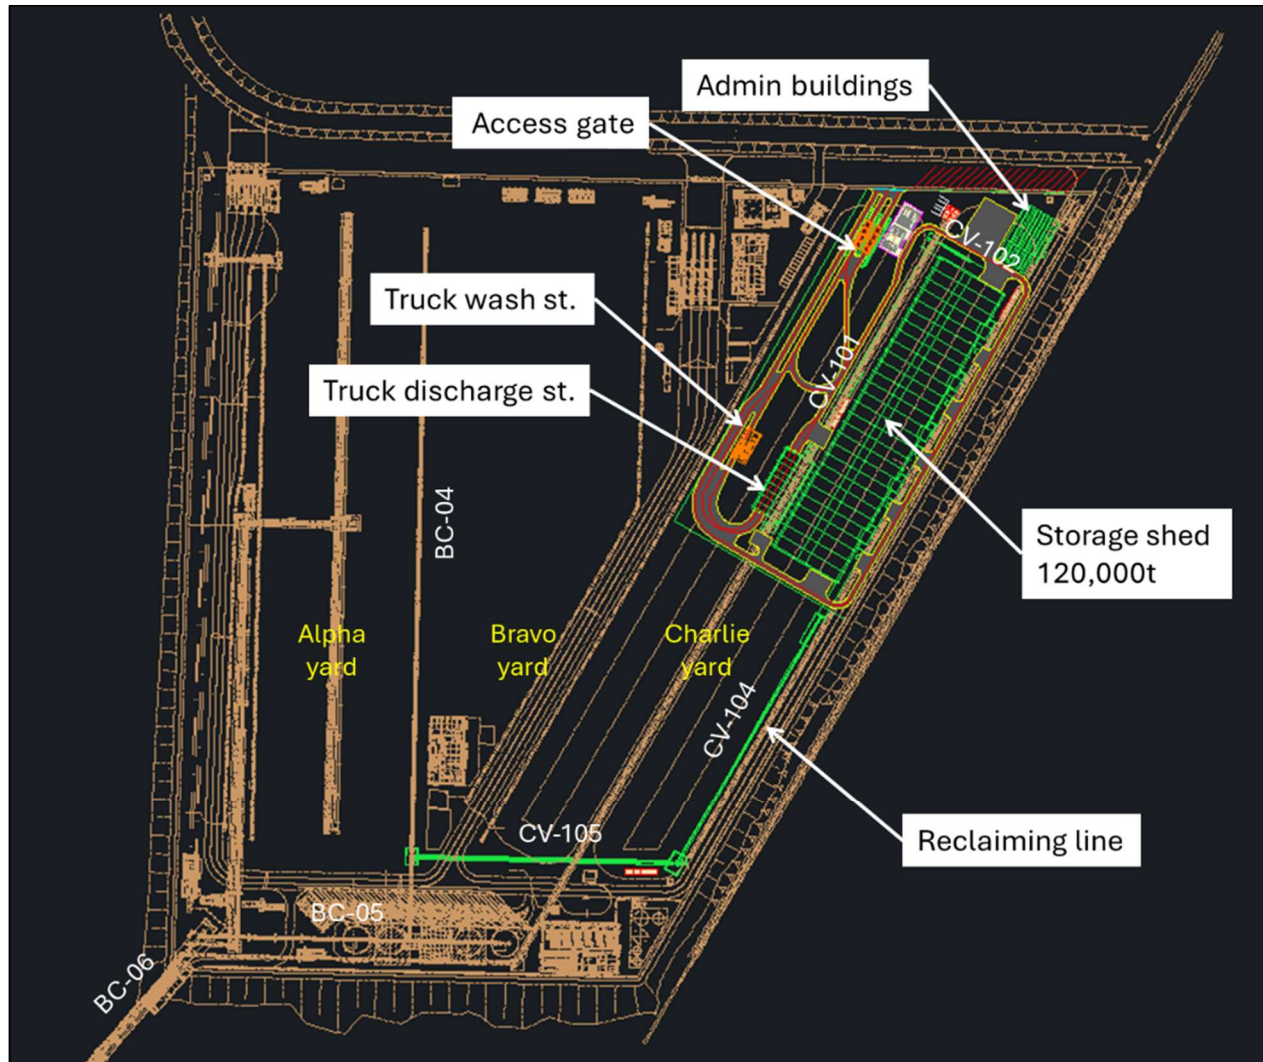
Proposed Rail Yard Layout at Port Qasim
